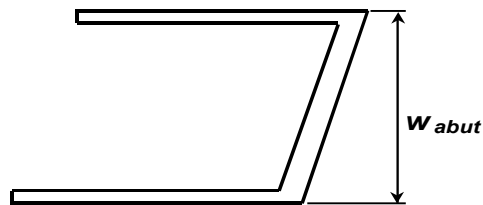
Effective Abutment Width for Skewed Bridges
